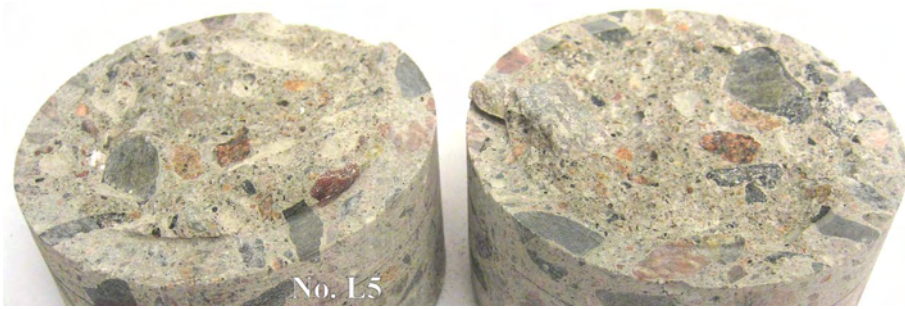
Photograph showing the failure surface for test No. L5 after fatigue test.
